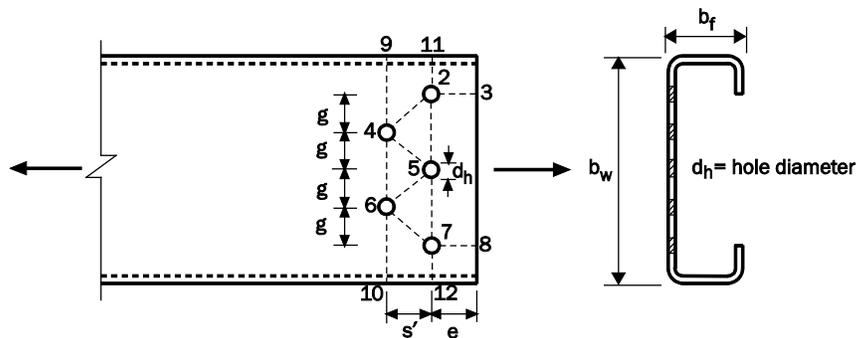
Potential Failure Paths of Stiffened Channel (Tension or Block Shear Rupture)
